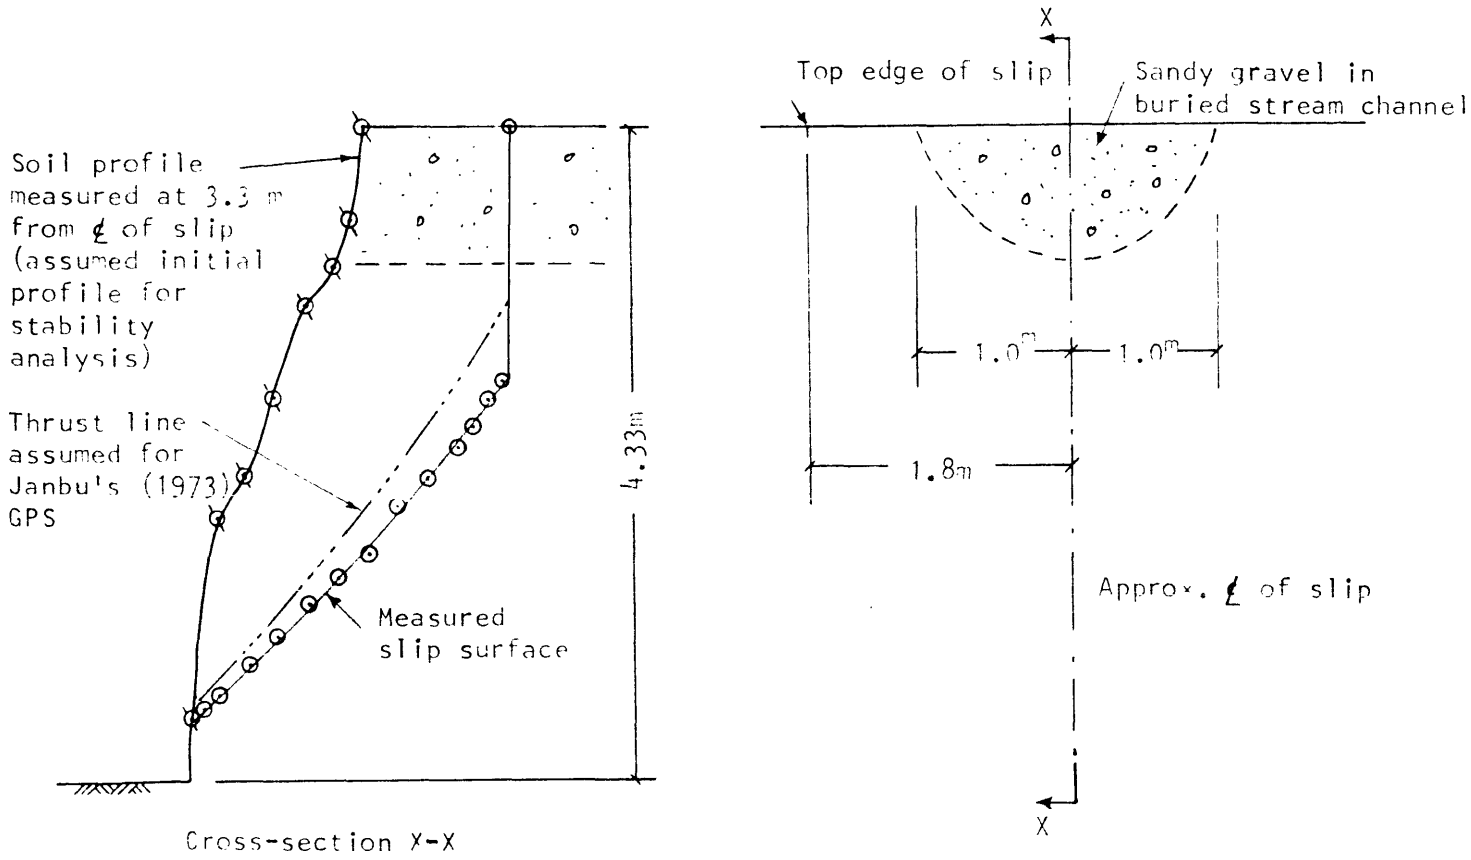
Front view and cross-section of Slip 2 at Site B
